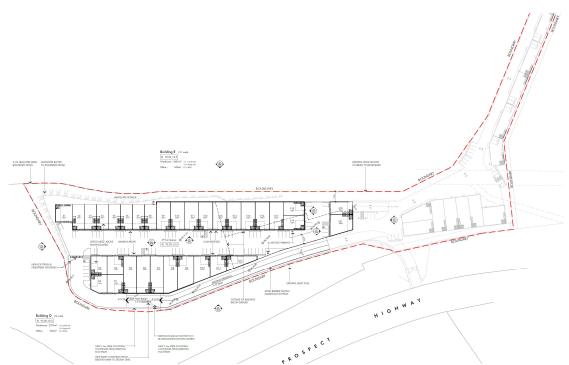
Precinct F Upper Ground Floor Plan – As Currently Approved (Source: Nettleton Tribe)
